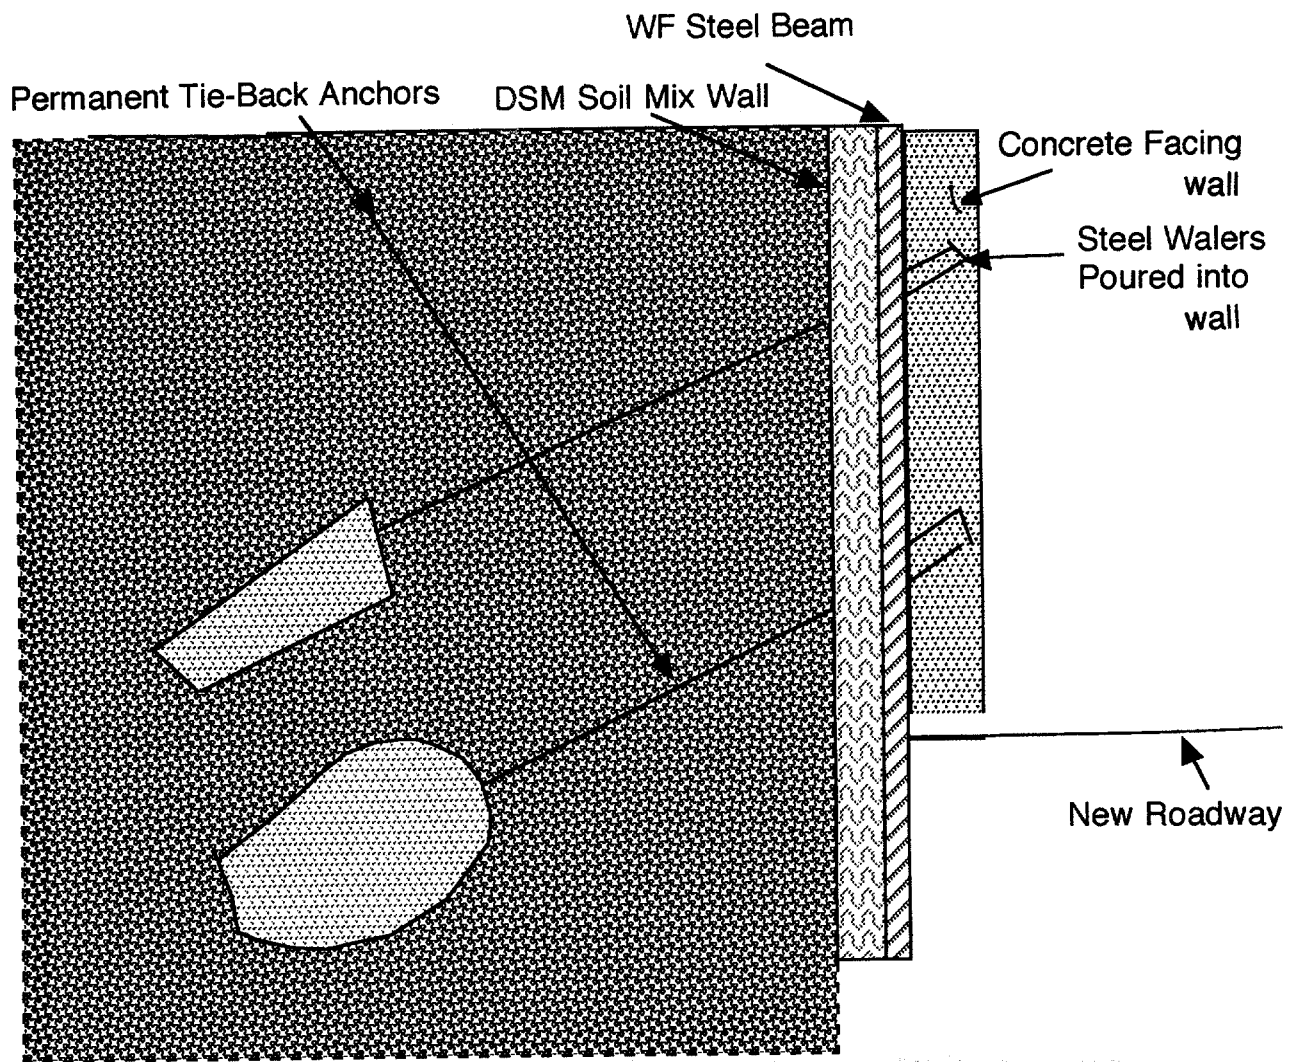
Cross section: Lake Parkway, Milwaukee, WI (Geo-Con, Inc., 1998).
